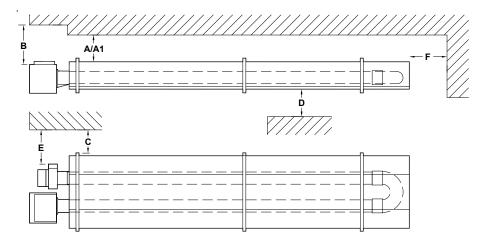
Diagram illustrating the clearance to combustibles (U Tube shown)
